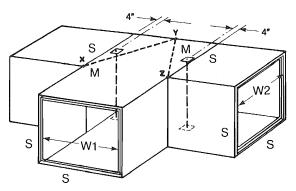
TEE REINFORCEMENT AT FEMALE SHIPLAP JOINTS
